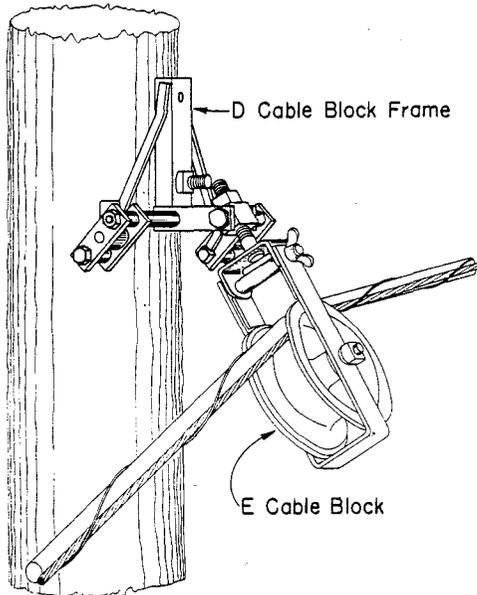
D Cable Block Frame (With E Cable Block Installed)
